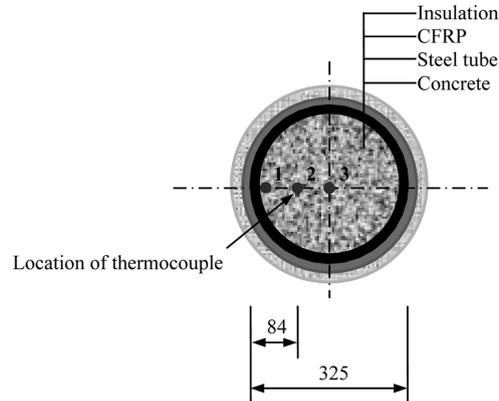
Cross-section of strengthened, insulated CFST column (Unit: mm)
